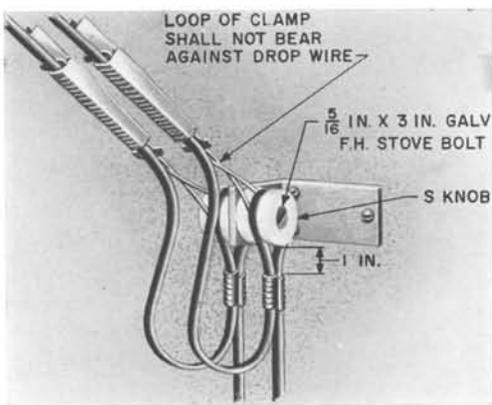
FIRST ATTACHMENT—HOUSE BRACKET (DROP WIRE RUN IN VERTICAL DIRECTION ON BUILDING)
